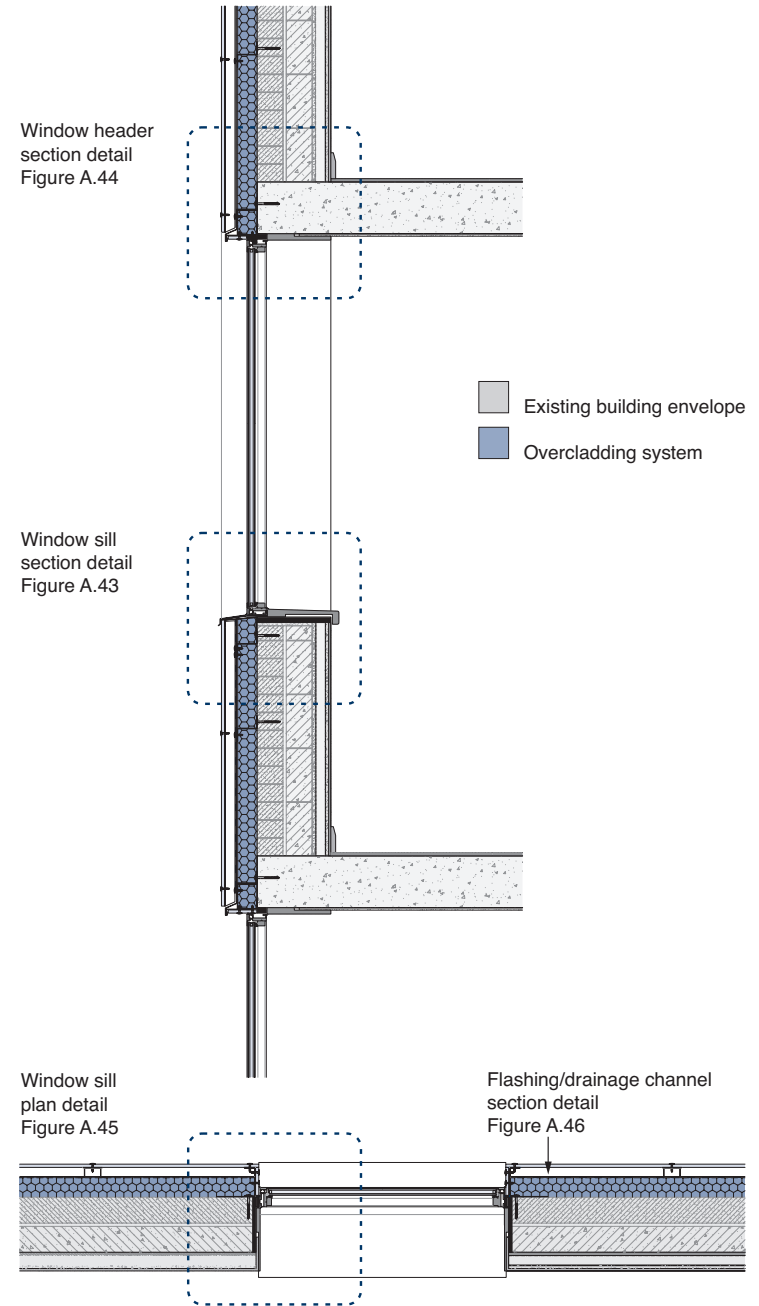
Section and plan views of a typical wall and window assembly with corresponding detail drawings denoted.
